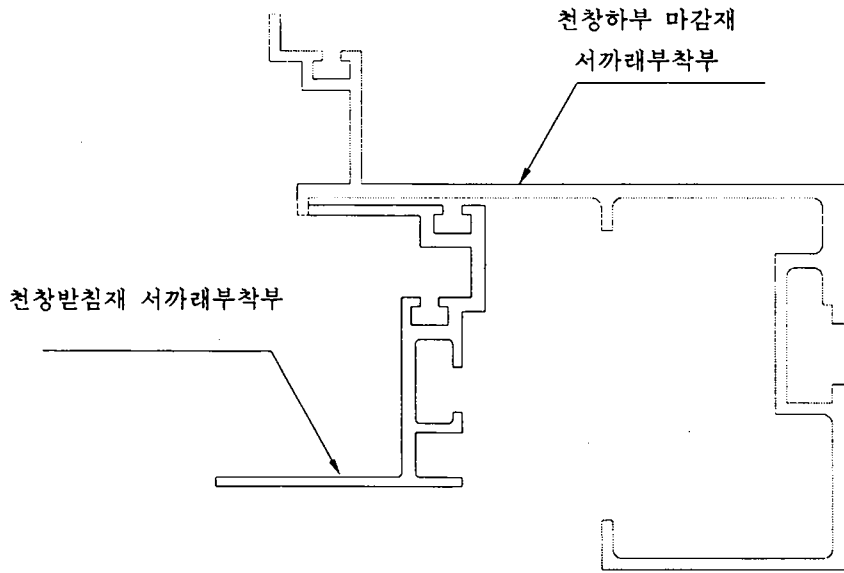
Build-up cross-section of bottom finishing and support member of top light
